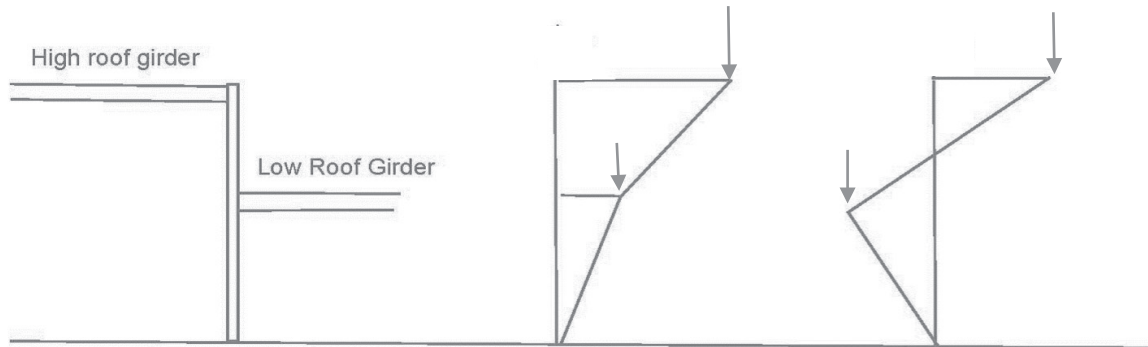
Section at Walls in a Tilt-up Building with a Low Roof that can respond out of Phase with the High Roof. Walls restrained at both roofs can experience large out of plane bending stresses and high anchorage forces. Similar conditions can also occur at tall walls shared by interior mezzanines.
